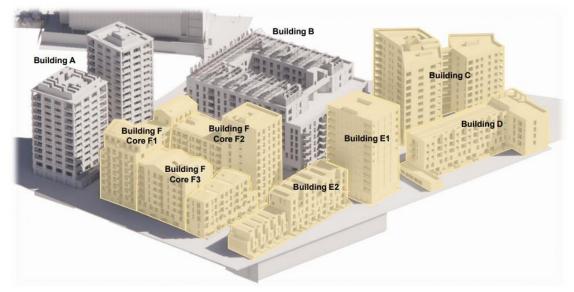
February 2025 Amended Proposed Development MS Parcel Site Layout
